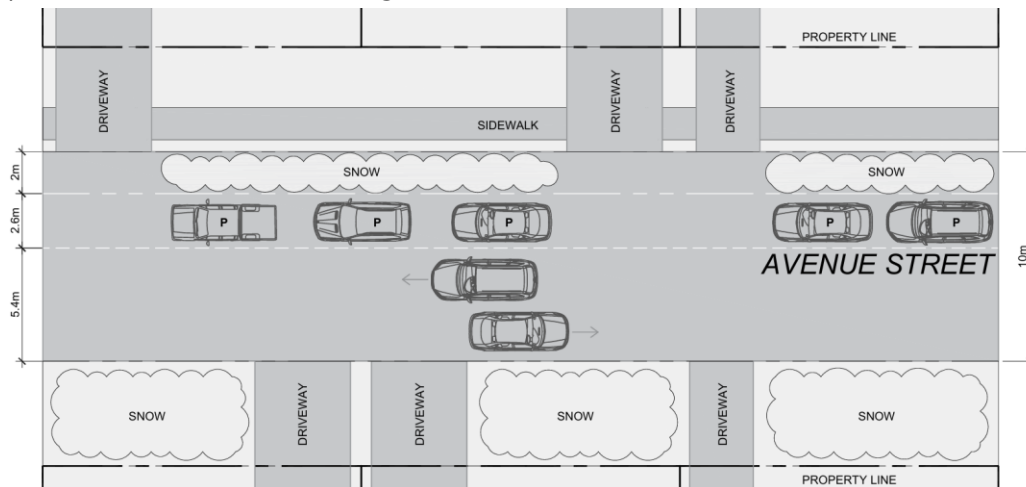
Street permit parking on one side of a 10m wide street with one sidewalk.
